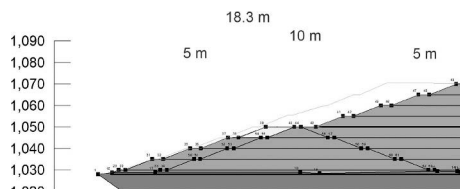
Left slope of the embankment of dry stacking (at the cross section).
